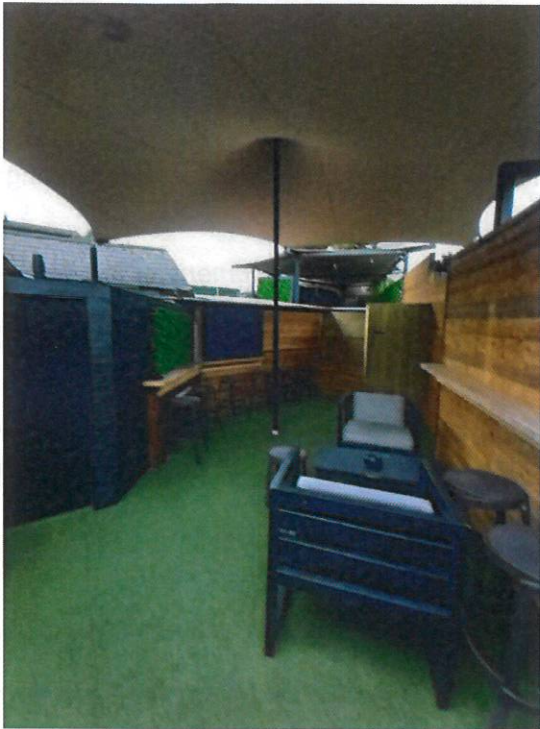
Upper outdoor area to rear closed off with wooden door. Roof, new support structures, and lighting etc. serving same in situ.
